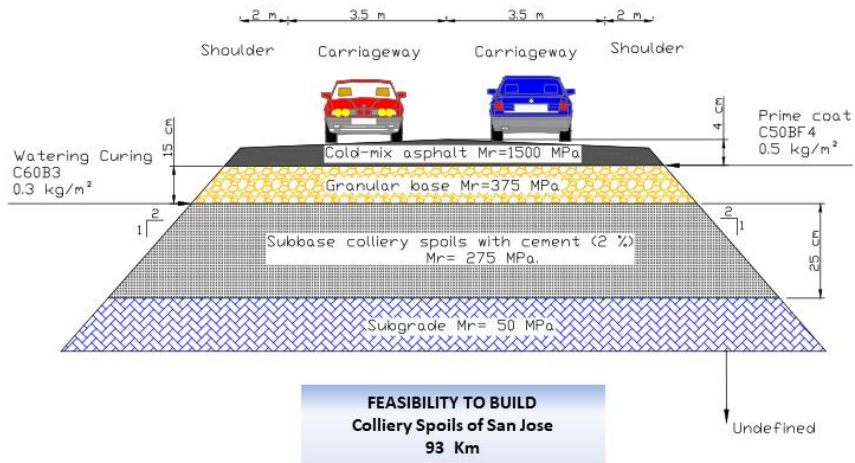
Cross-section of the road using colliery spoils bound with cement.
